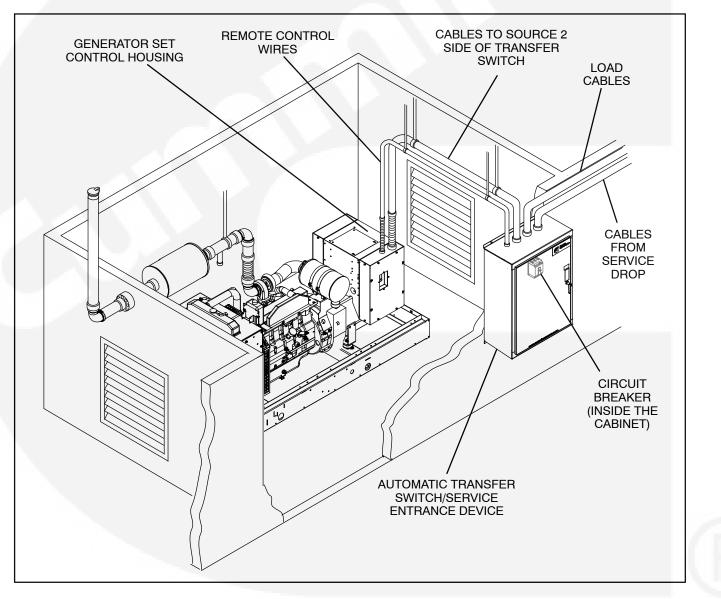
TYPICAL WALL-MOUNT INSTALLATION
